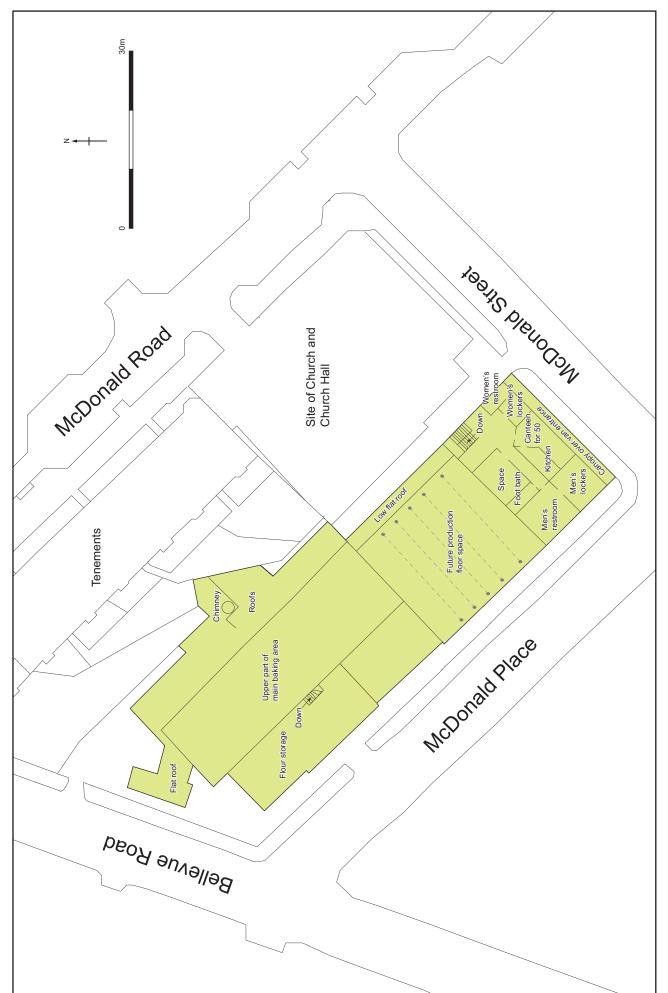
MDE07: First floor plan of Crawford's Bakery, 1956 extension.
